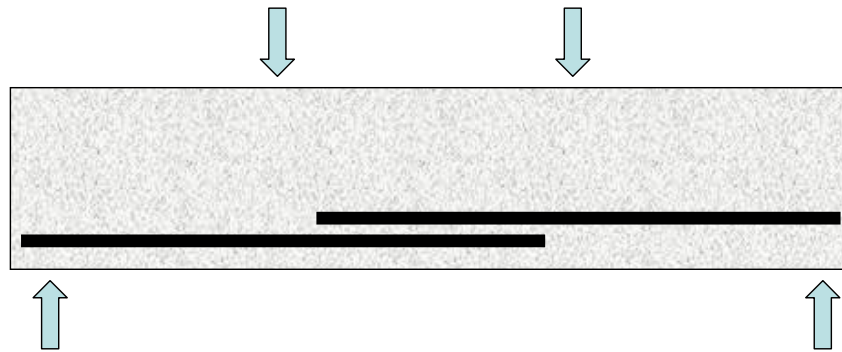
Schematic of beam-splice test (adapted from ACI 408R-03)
